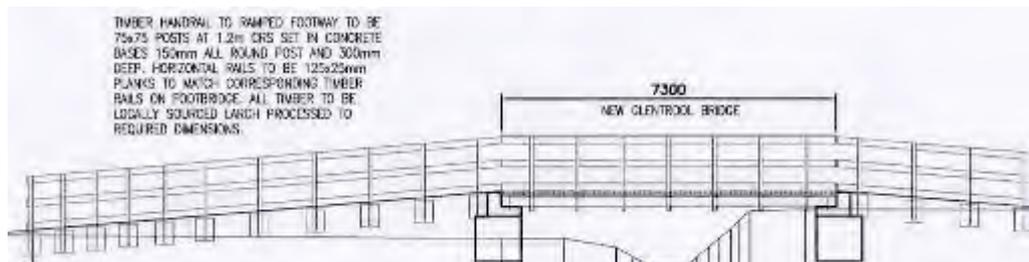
Proposed elevations – 'Glentrool' type footbridge
